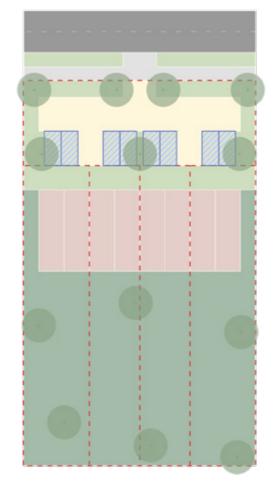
On plot car parking situated to the front of properties: acceptable parking court arrangement.
